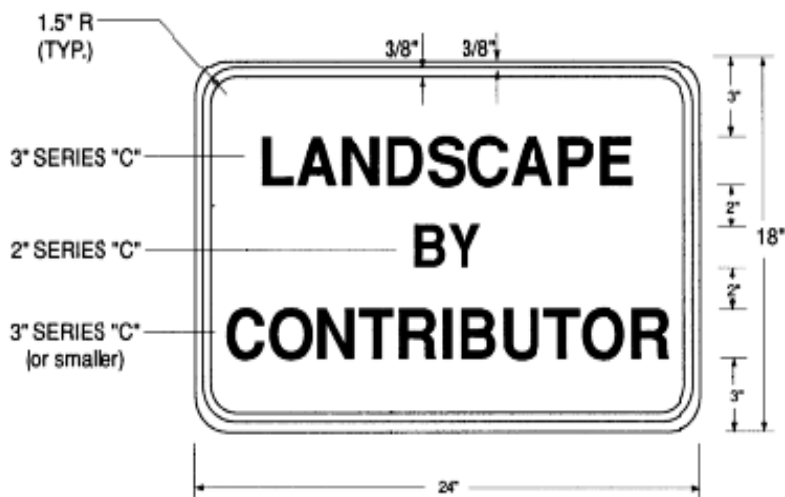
Arterial and Limited Access Landscape Roadway Sign
